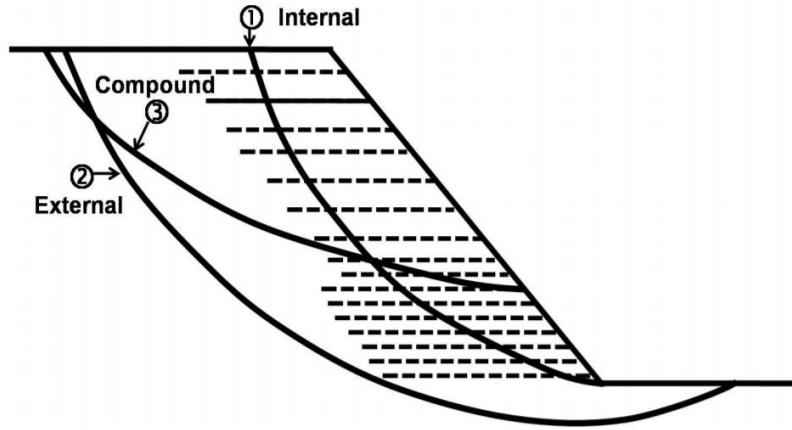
Failure modes for reinforced waste slopes including internal failure within the reinforced waste zone, external failure entirely outside the reinforced waste zone, and compound failure starting behind and passing through the reinforced waste zone.
